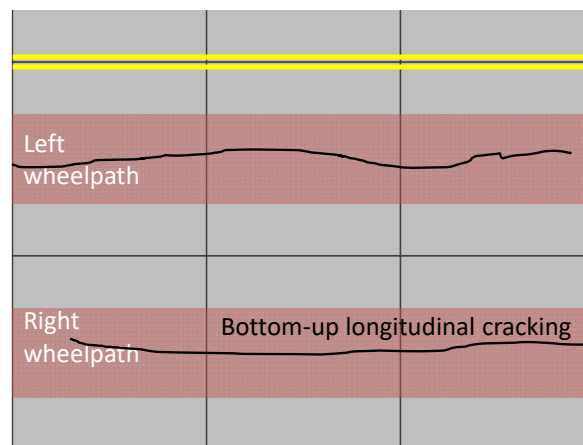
Layout and typical cracking pattern of half-lane-width slabs.
